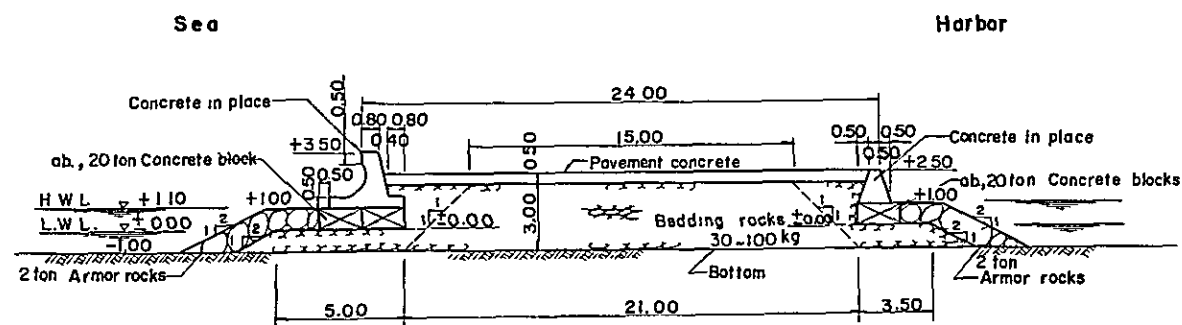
Rubble-Filled Caisson Breakwater (2)
